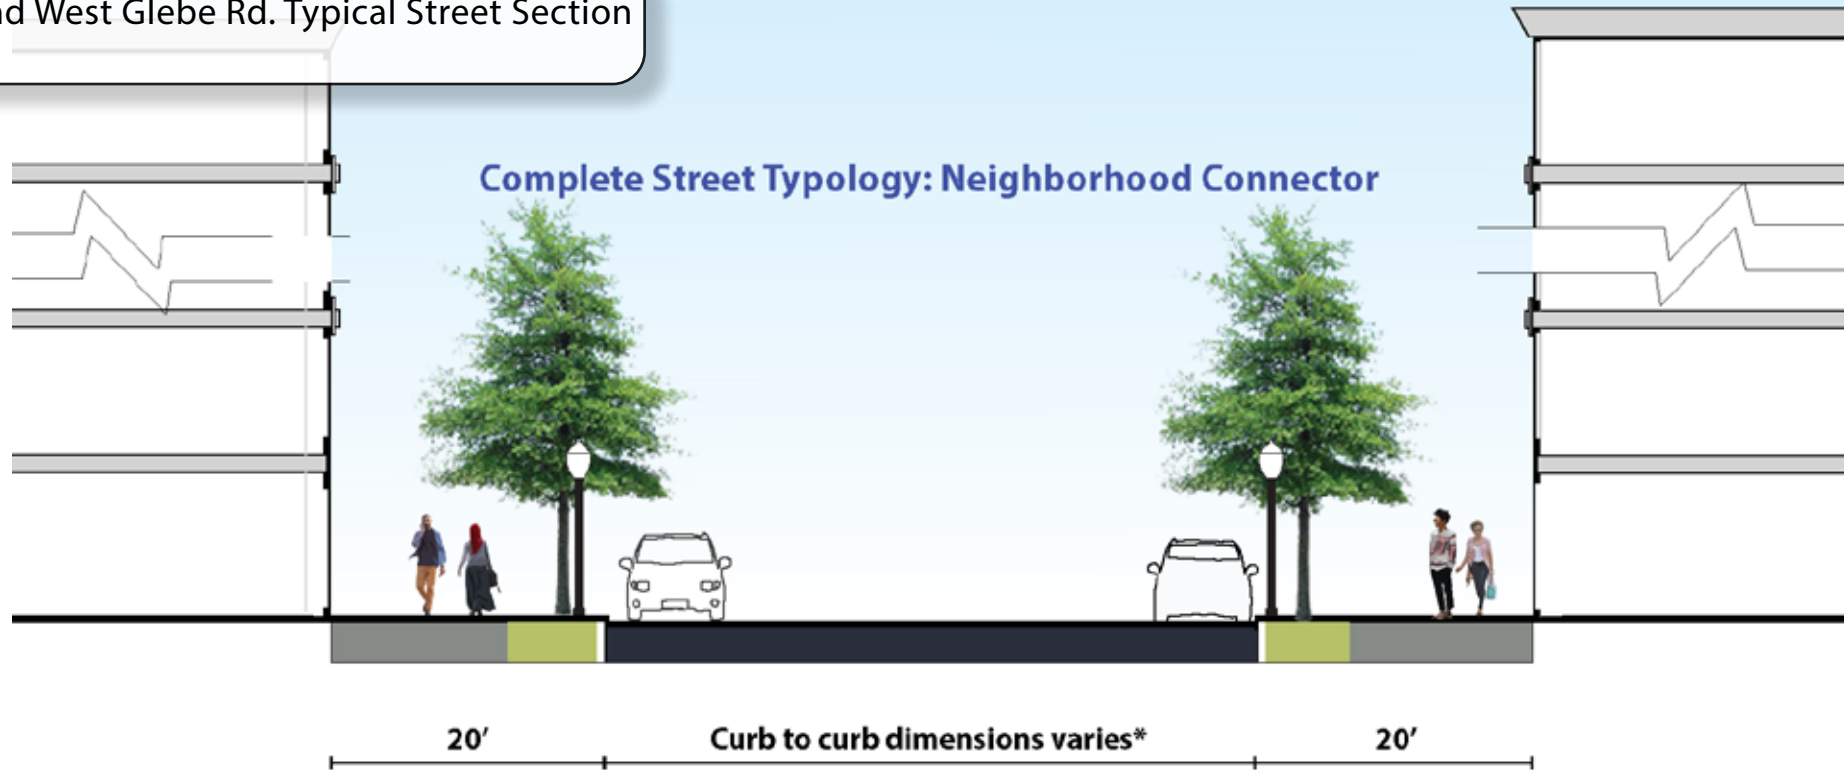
A: Mount Vernon Ave. / East and West Glebe Rd. Typical Street Section
